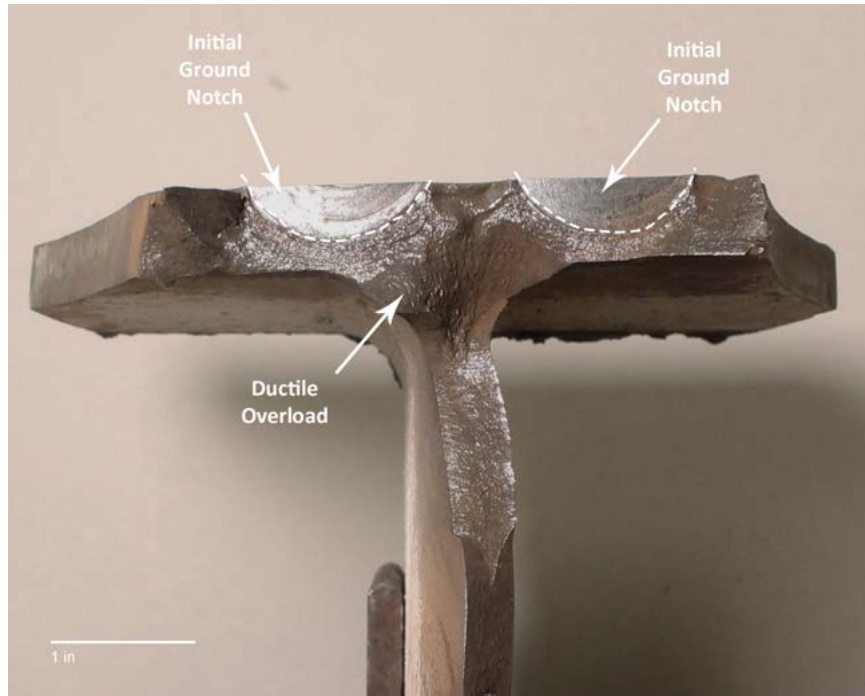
W24RBS-0.375N-T59 top flange fracture looking towards the end-plate.
